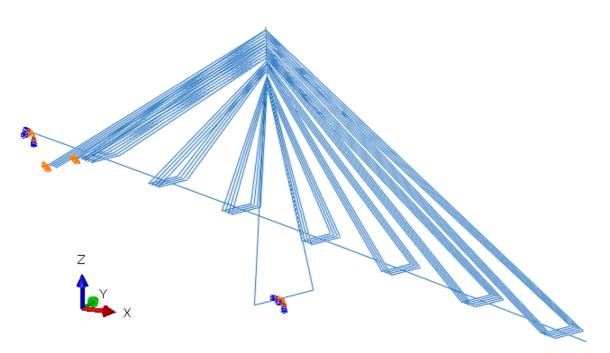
Boundary conditions on cable stayed bridge, global FE-model. The bridge girder is fixed towards the southern abutment, and first cable group from south abutment is pinned to the ground. The tower is fixed to "the ground".
